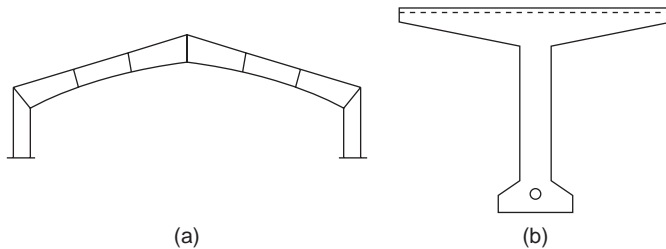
Example 1(B) – (a) Gable frame, (b) Precast beam.
